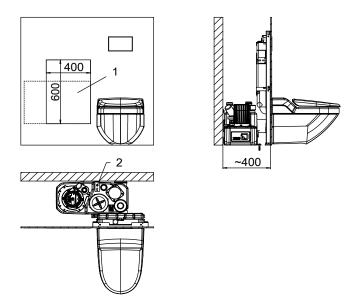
Installation information for direct connection of a mini-Compacta US40 (concealed in a suitable pre-wall system) to a wall-mounted toilet bowl
